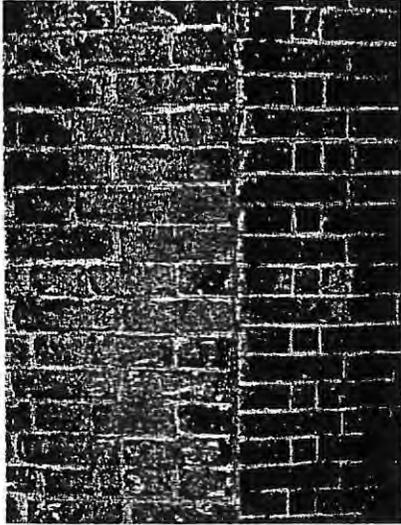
Brick seam between Dutch House and adjoining building to northeast.
